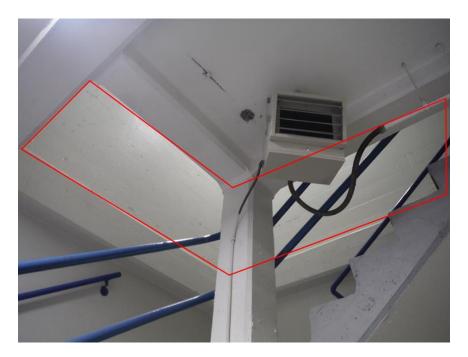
Large Diaphragm Opening Adjacent to Shear Walls
